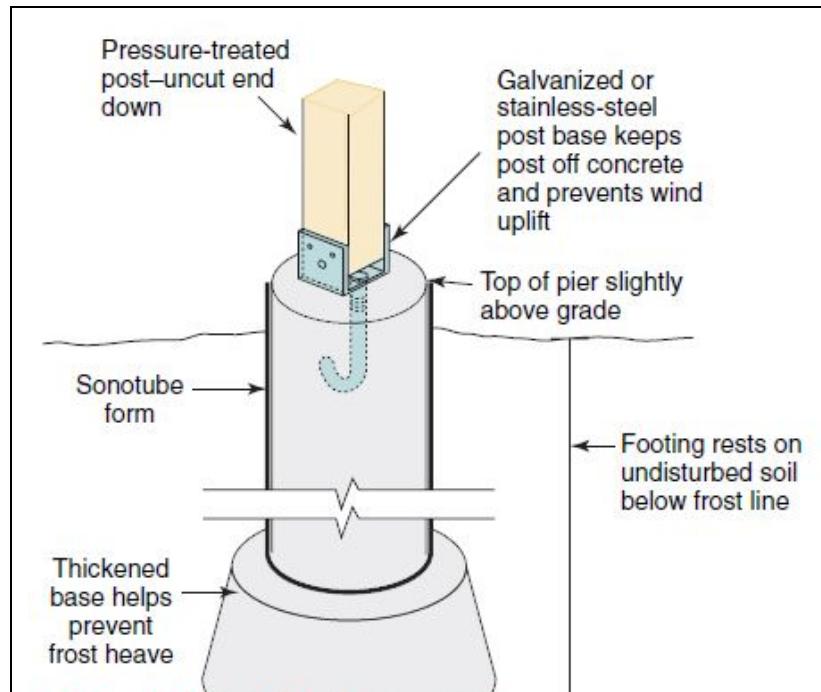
Sonotube Foundation (© - BuildingAdvisor.com)
